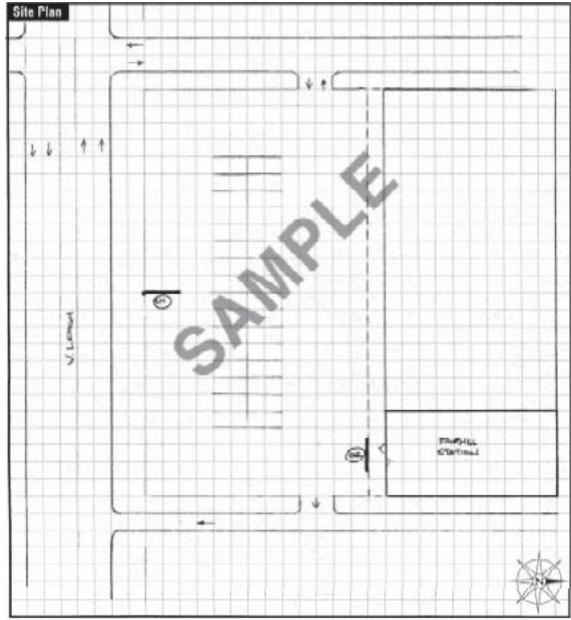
Typical Exterior Plan View -Post Office as Mall Tenant
